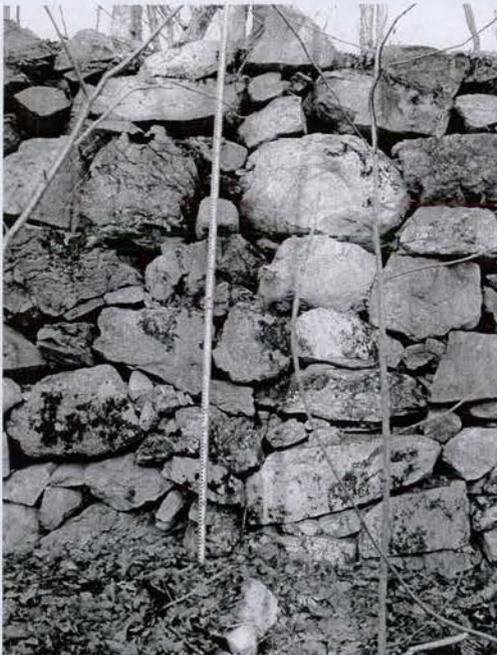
12-12-1-2005 London Bridge E wall, North to South, Section 8B View W
